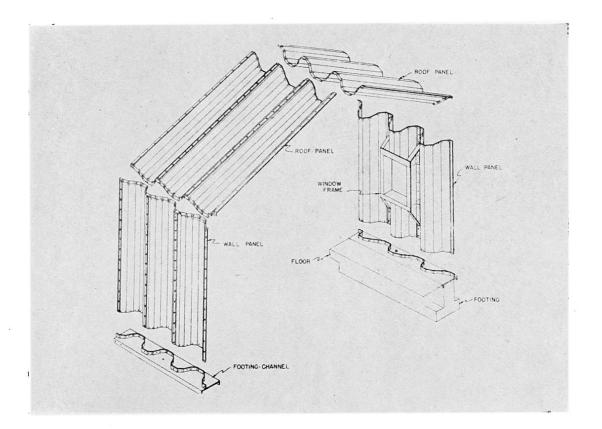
Construction details of frameless building of Fig. 10. Individual, rigid trough members up to 34 in. wide, 7.5 in. deep (Behlen Manuf. Co.)
